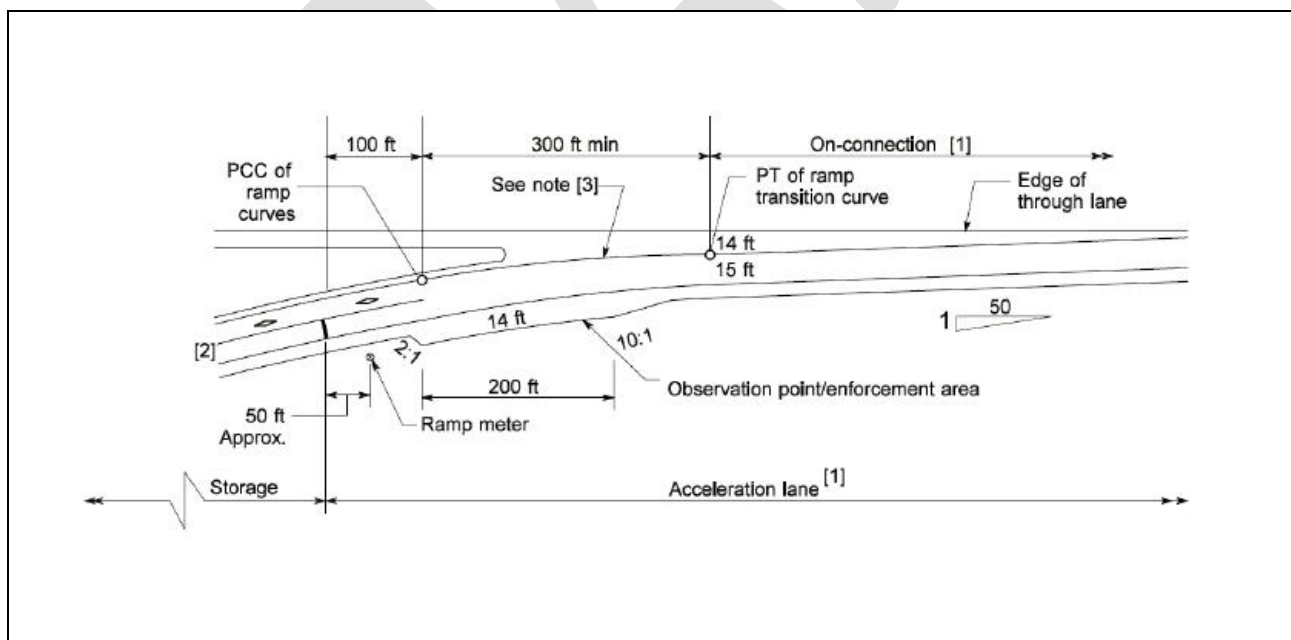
Two-lane Ramp Including a Single Lane Ramp and a Single Metered Lane with an HOV Bypass (Source: WSDOT Design Manual June 2009)
